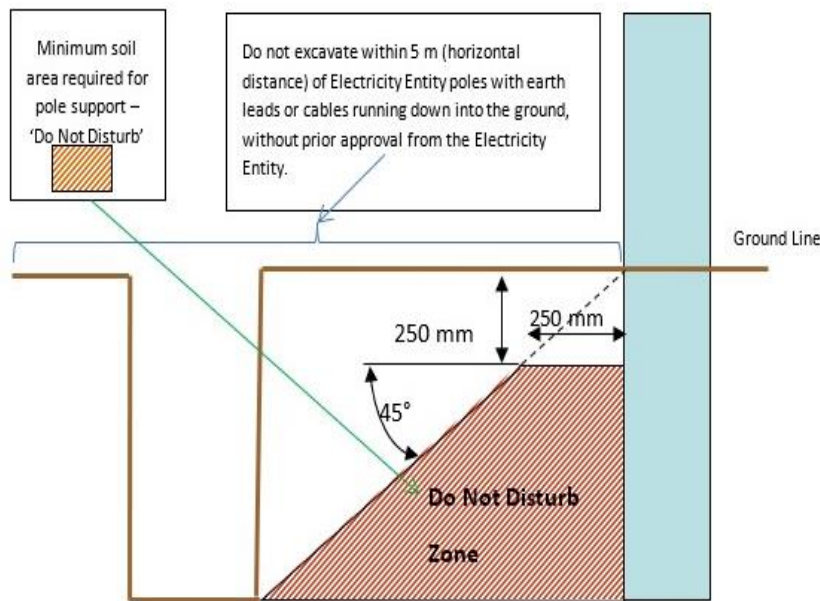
Do Not Disturb Zone requirements when excavating near poles
